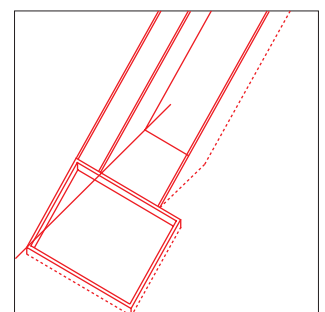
Lines extracted from the drawing above, depict how the roof plan generated new compositional elements.
